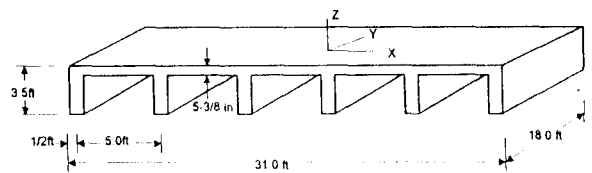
Schematic of the 1/3-scale reinforced concrete deck
